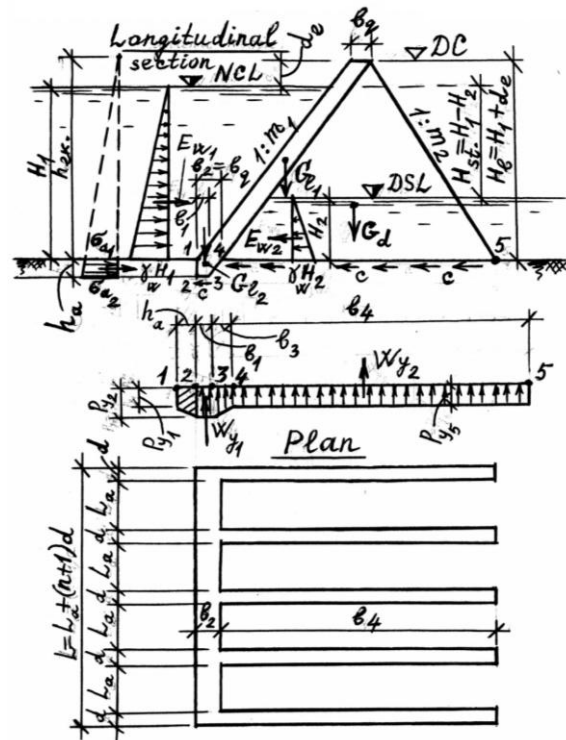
Scheme for calculating the stability of a buttress-type reinforced concrete levee dam with an inclined plane cover in the process of landslides.
